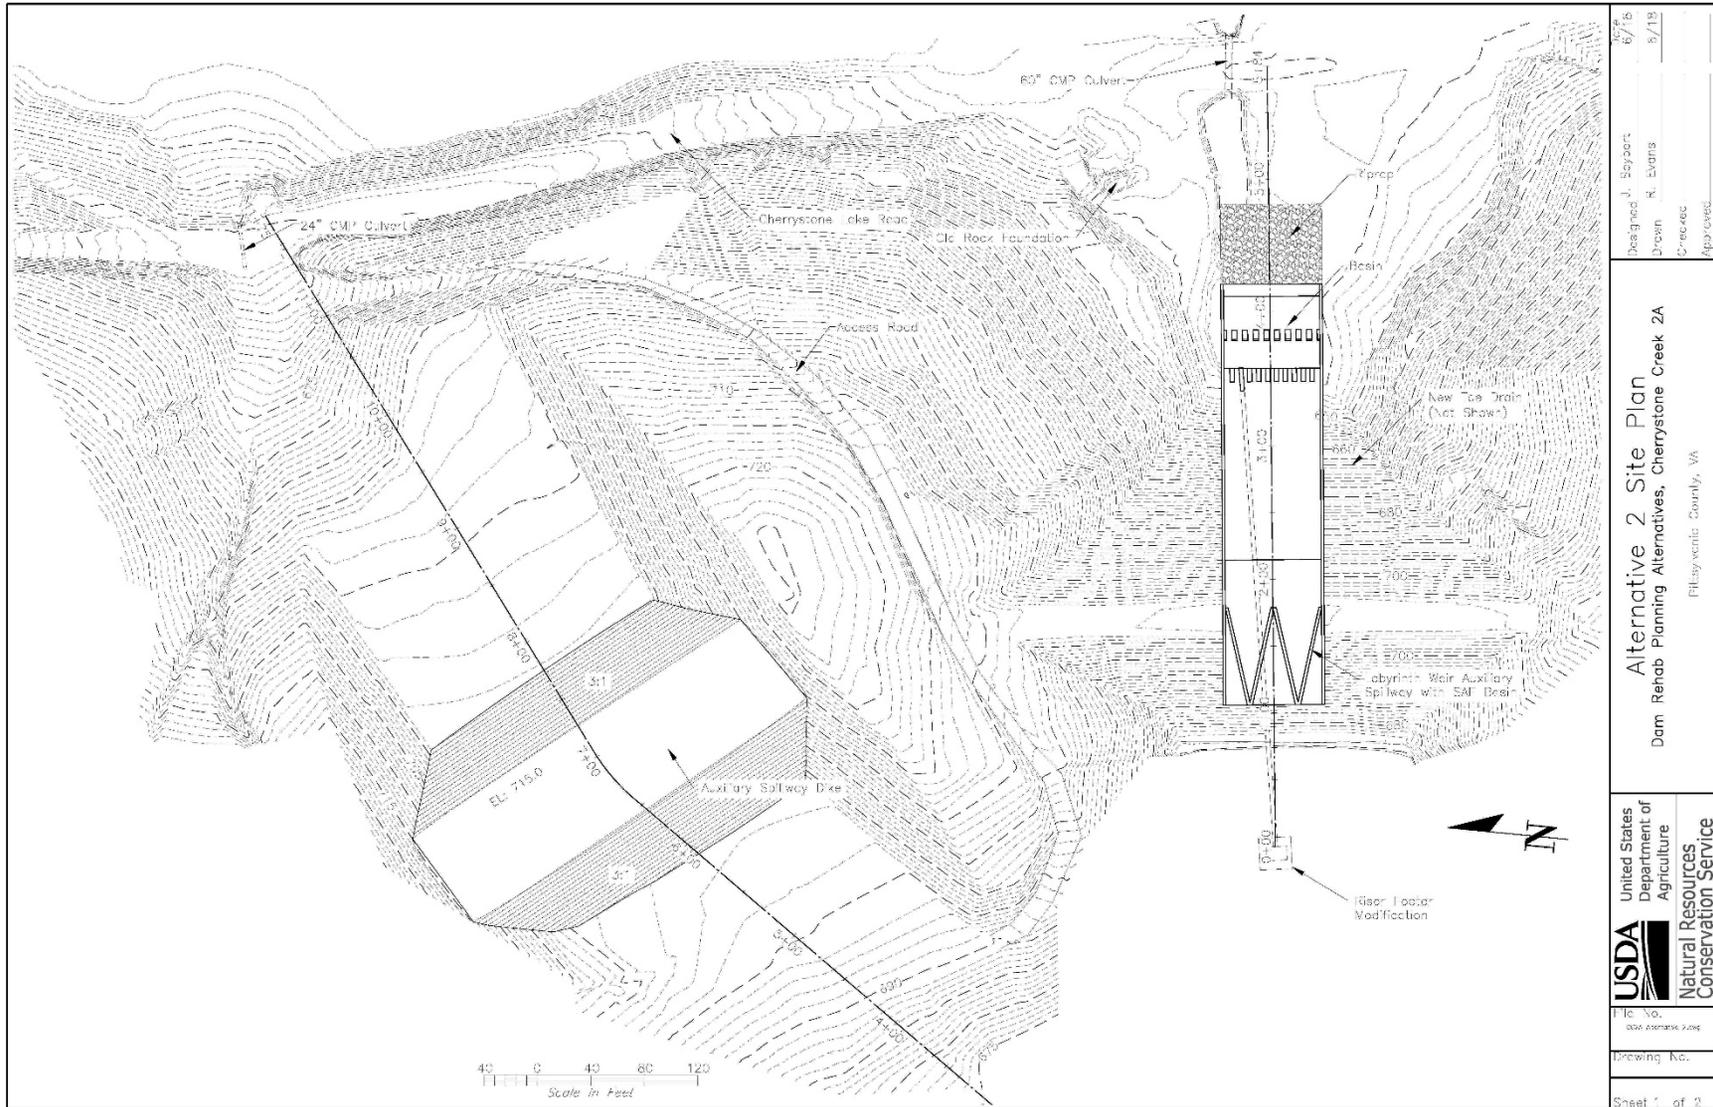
Alternative 2 – Reinforced Concrete Labyrinth Weir Over the Dam.
